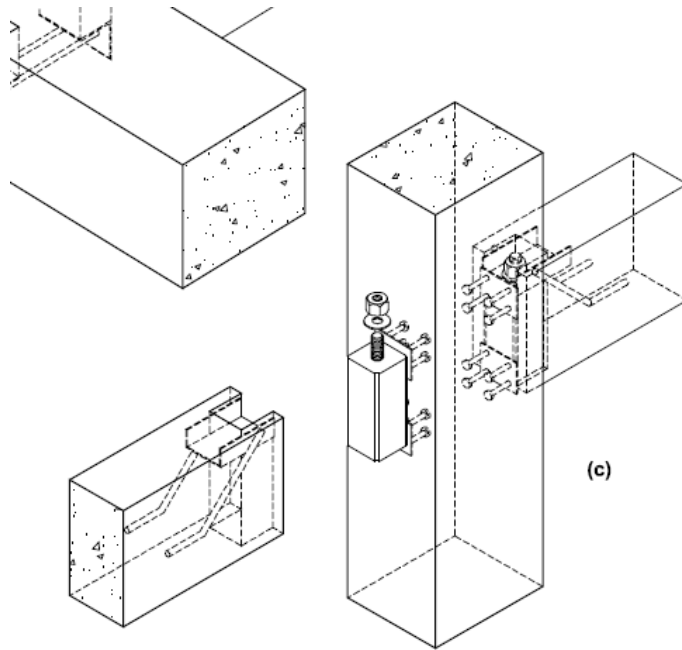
Typical hanger detail as found in PCI 6th edition.
